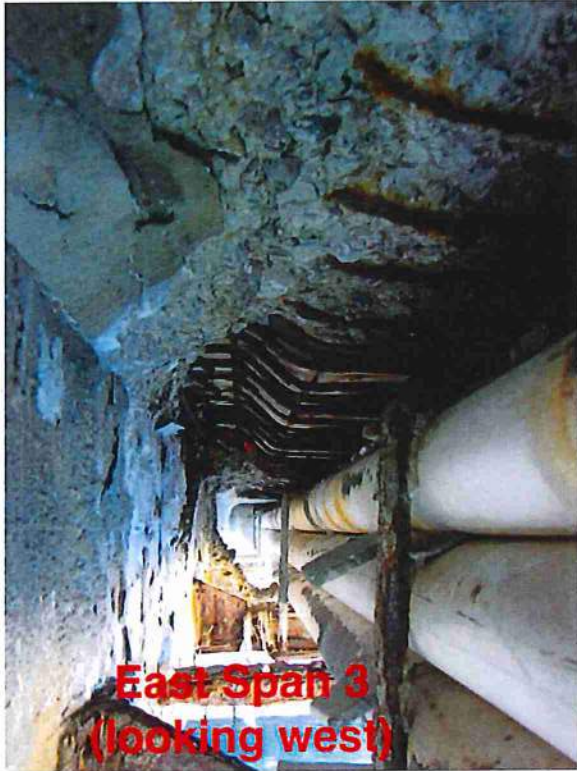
Span 3, bay 1, spall extending from east abutment to beyond midspan looking west
